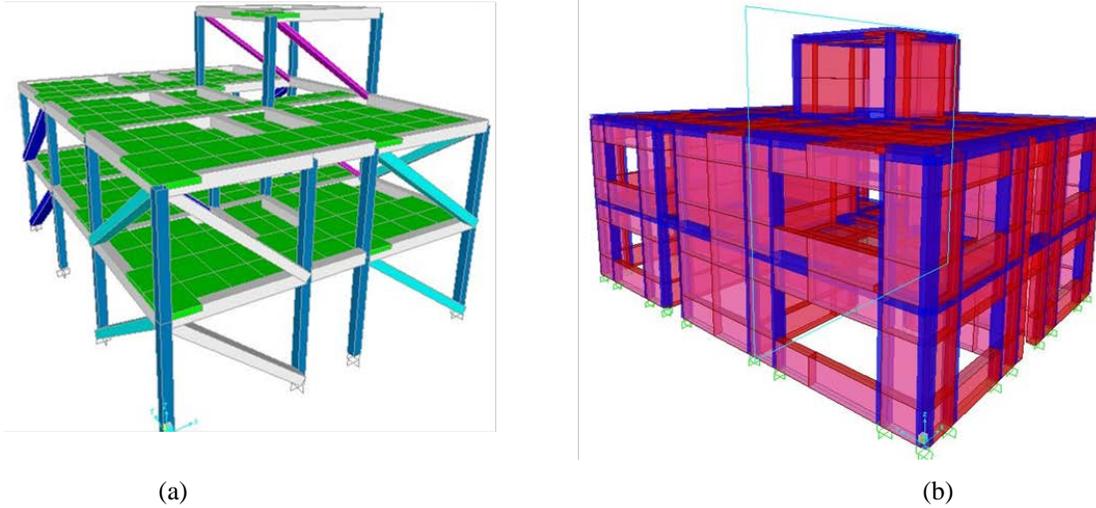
SAP models of Building 2: (a) RC frame with masonry infill (b) confined masonry
